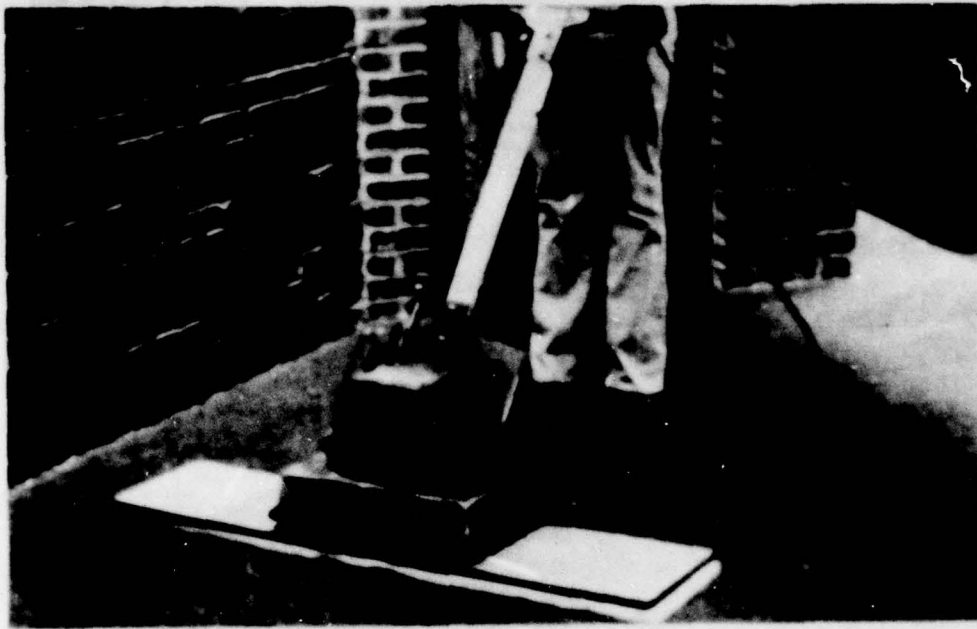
Surface brightening using an aerosol mist and an oscillating plate scrubbing machine.
